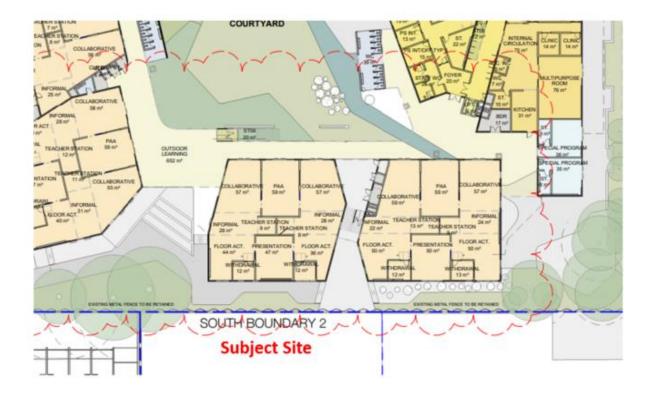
Ground floor plan of school, showing landscaped setback from the shared site boundary
